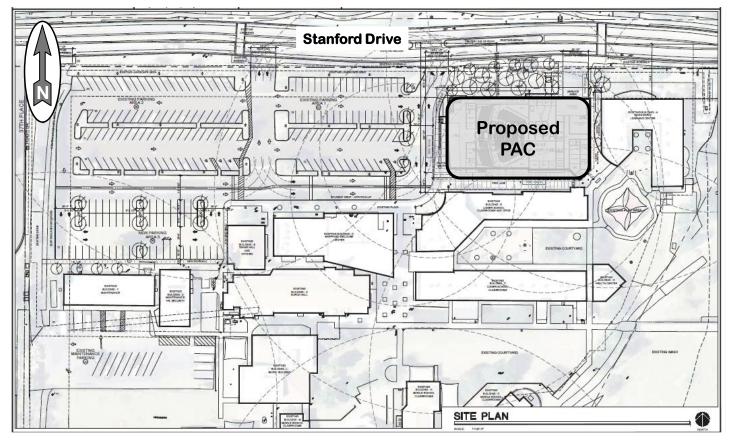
Phoenix Country Day School Performing Arts Center Site Plan
